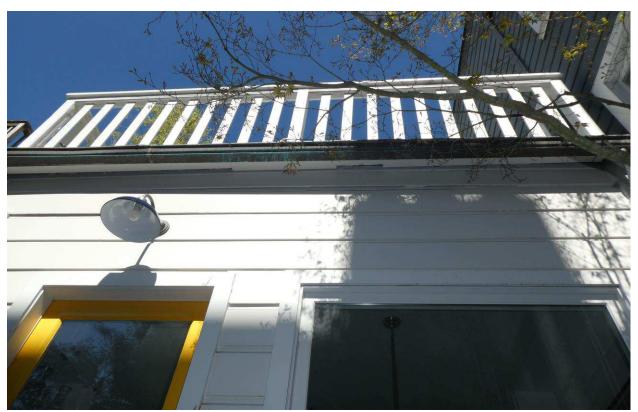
Detail of the bulging top siding board at the southeast side of the first floor kitchen.
